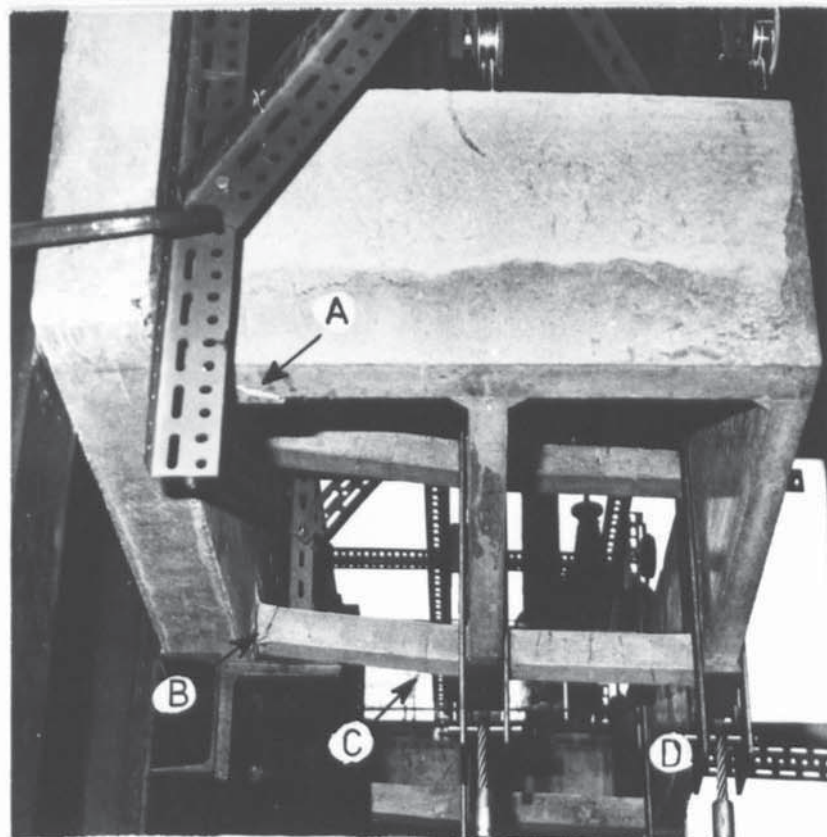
STRUCTURE 13 AFTER FAILURE
